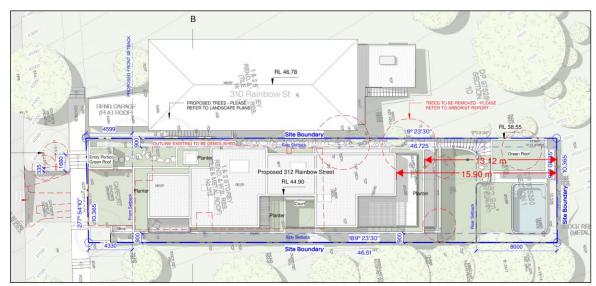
Site plan demonstrating the location of the balcony at 310 Rainbow St in relation to the proposal.
